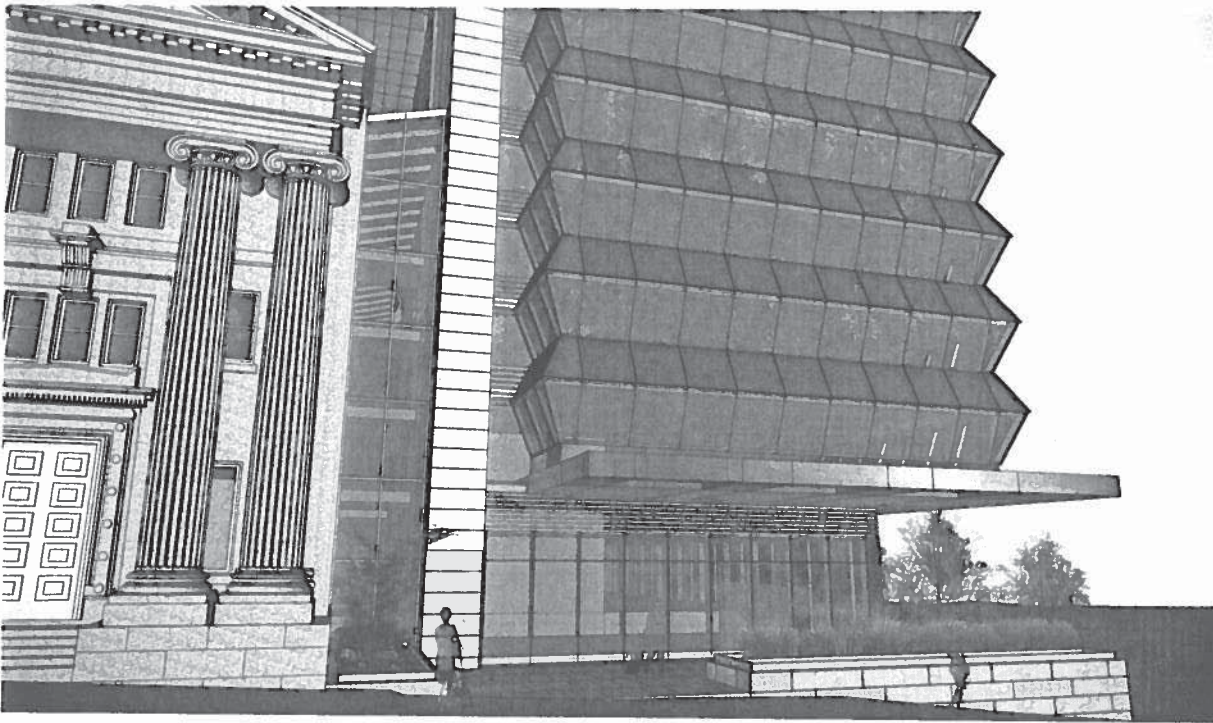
George Street facade of the conserved Bank of Commerce Building, atrium and hotel plaza.
